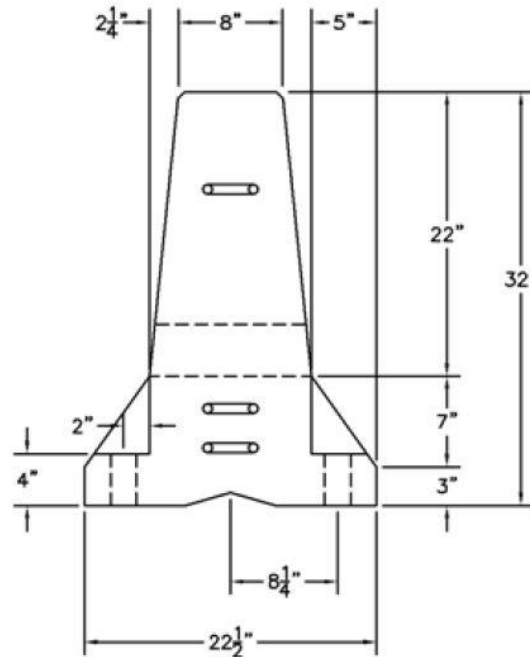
Cross-Section of 32-in. (813-mm) Tall F-Shape PCB [1]
